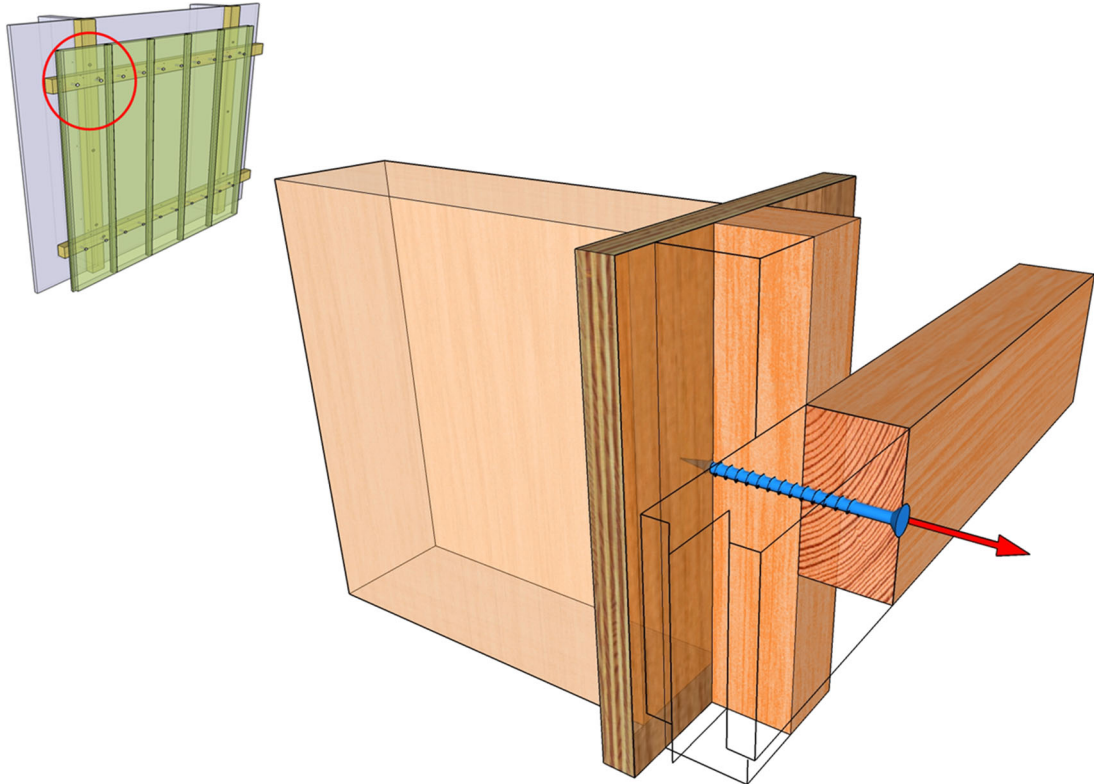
Timber-to-timber connection with fastener under axial loading
